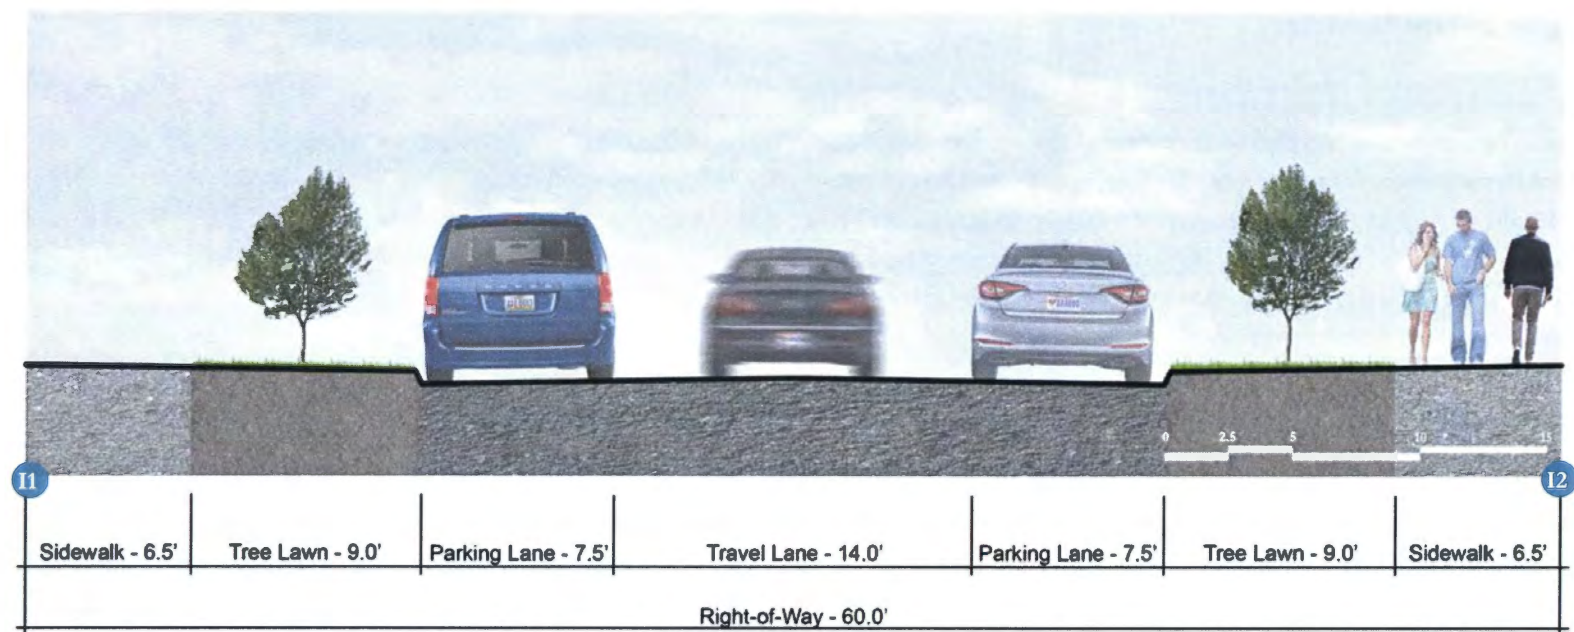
East 22nd Street between Chester Ave and Payne Ave Existing Section
